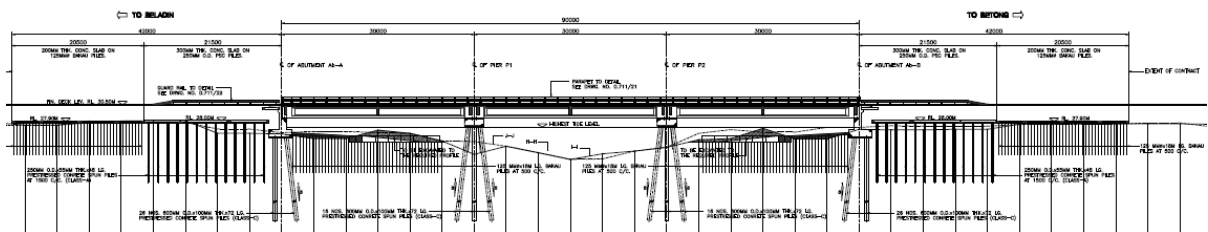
Longitudinal Section of Sg. Sawit Bridge
